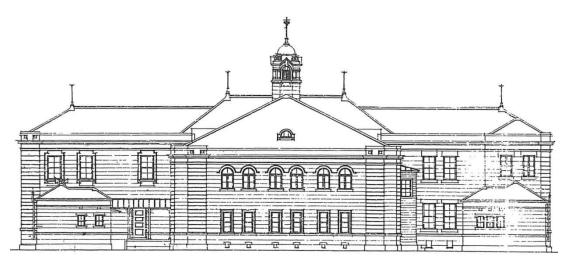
Elevation of north side in 1916, when the Assembly Building was constructed (back side)
